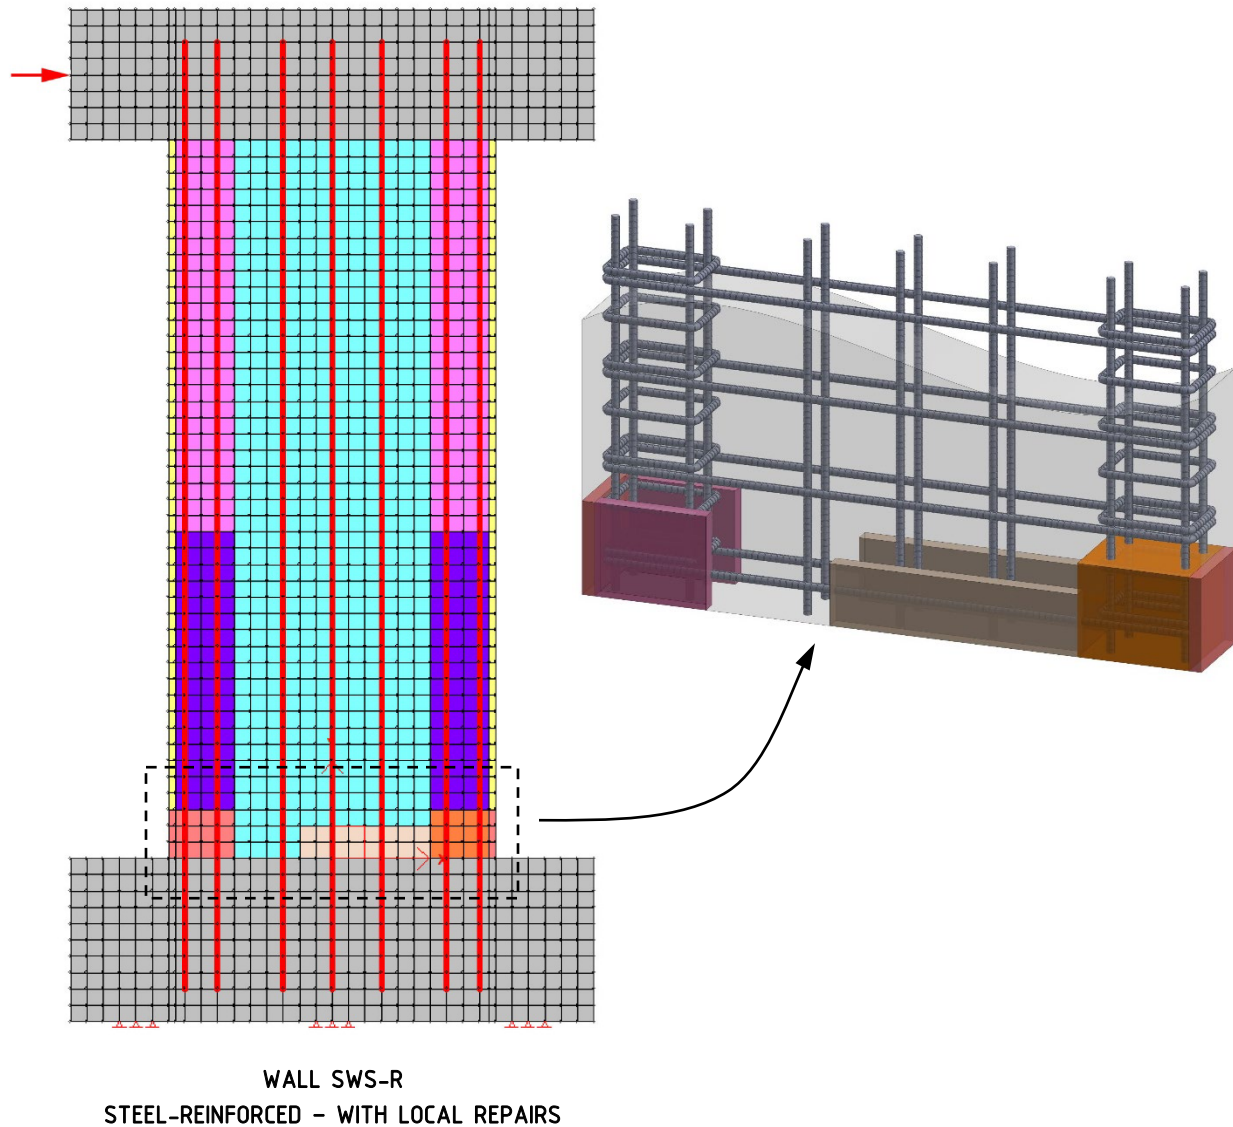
Arrangement of finite element repair layers for Wall SWS-R.
